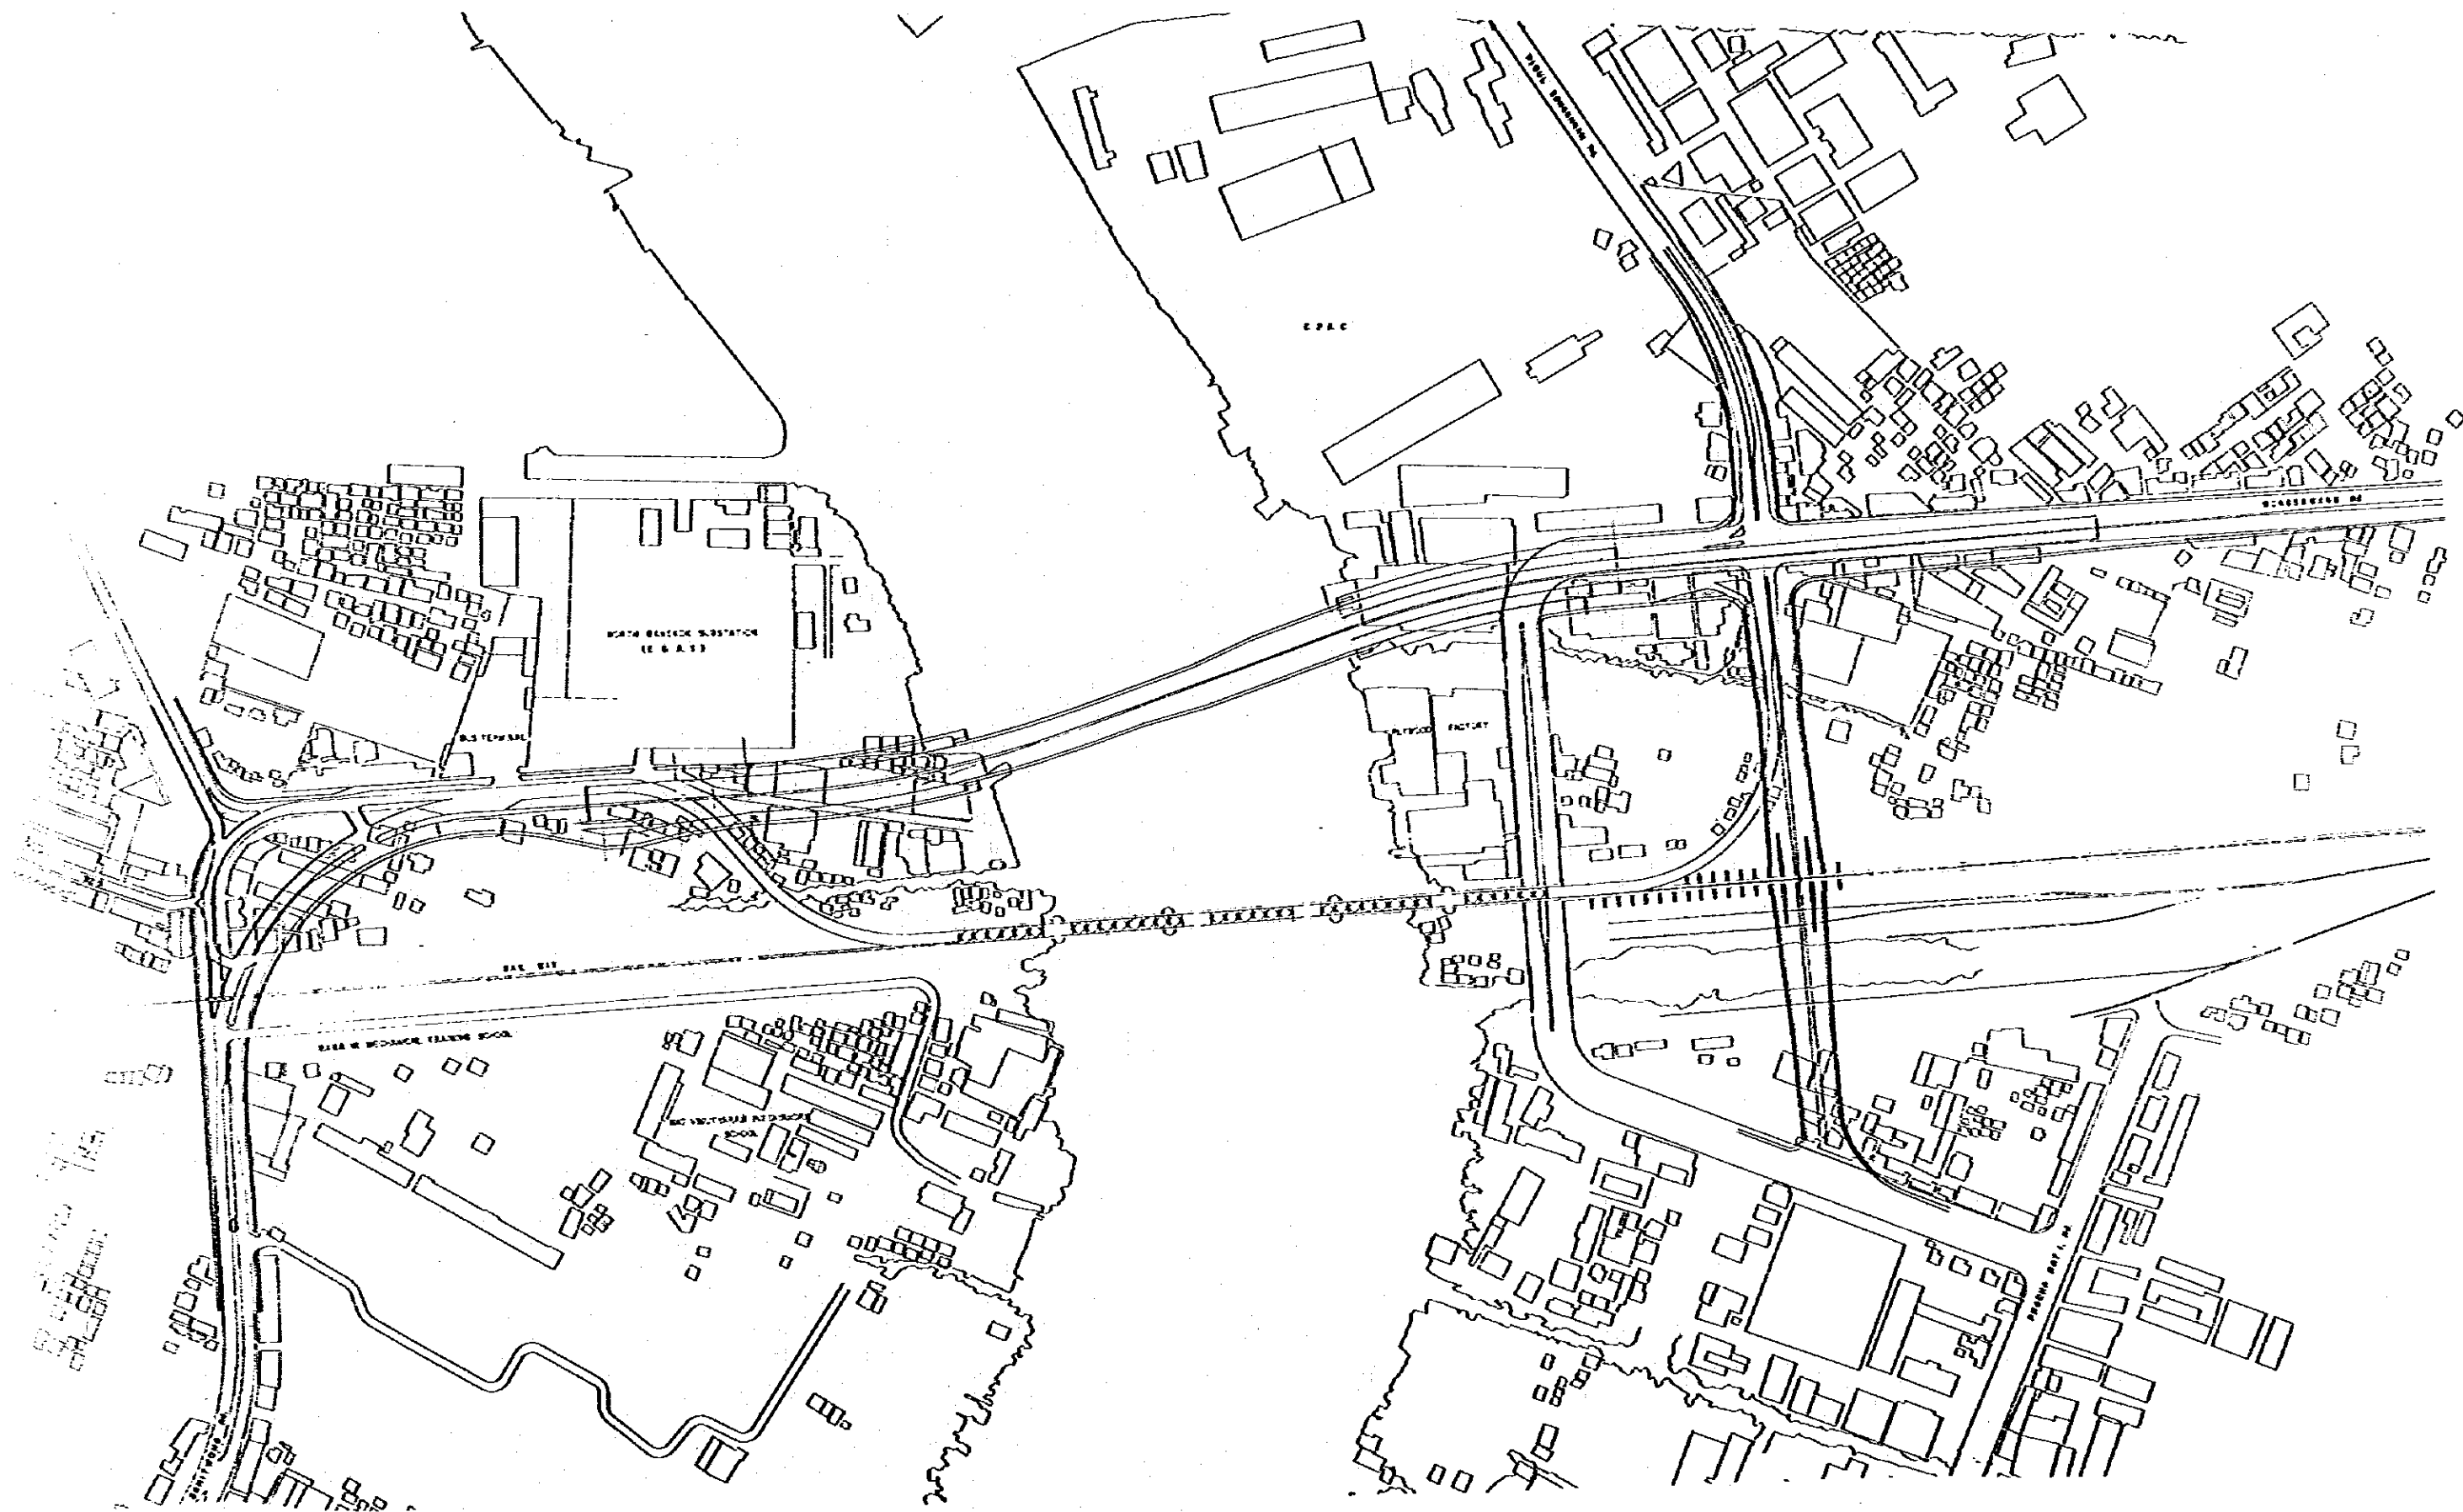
PLAN OF ALTERNATIVE IIB
